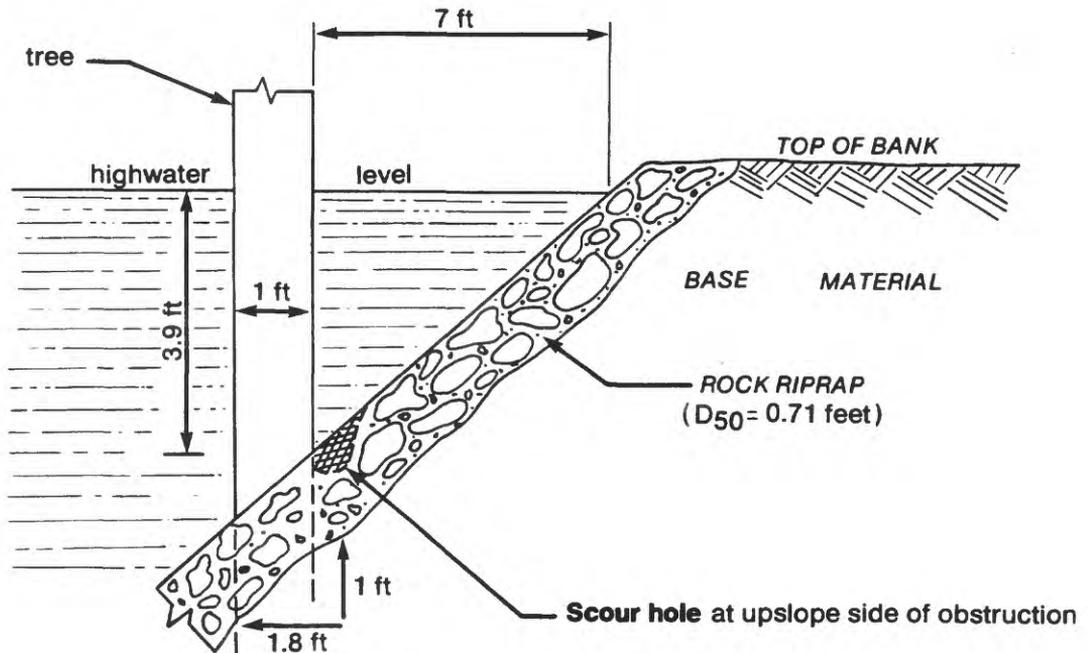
Sketch of scour hole in riprap adjacent to obstruction on streambank.
